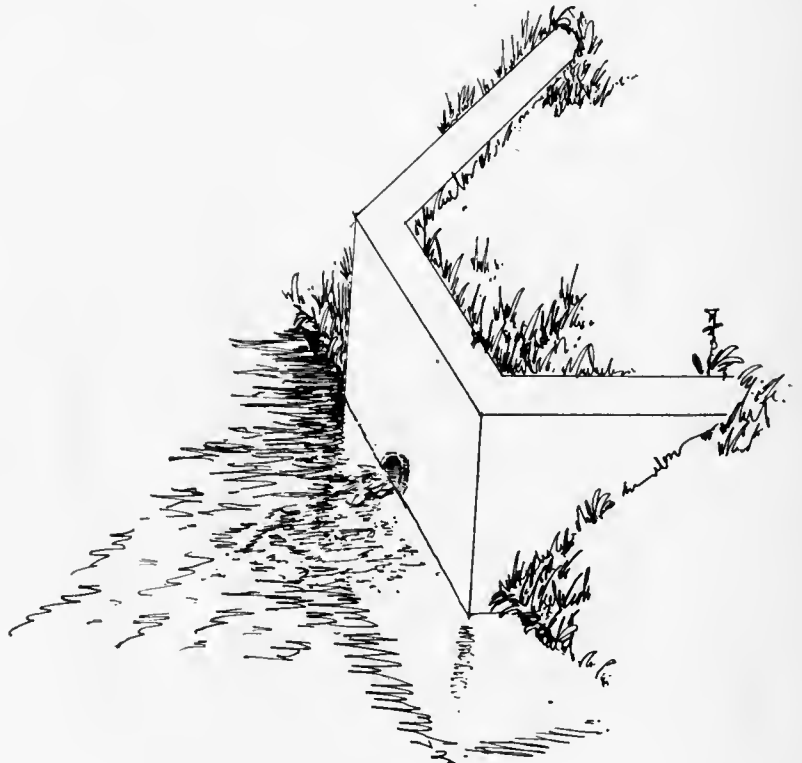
Wingwalls Prevent Bulkhead From Being Washed Out.
